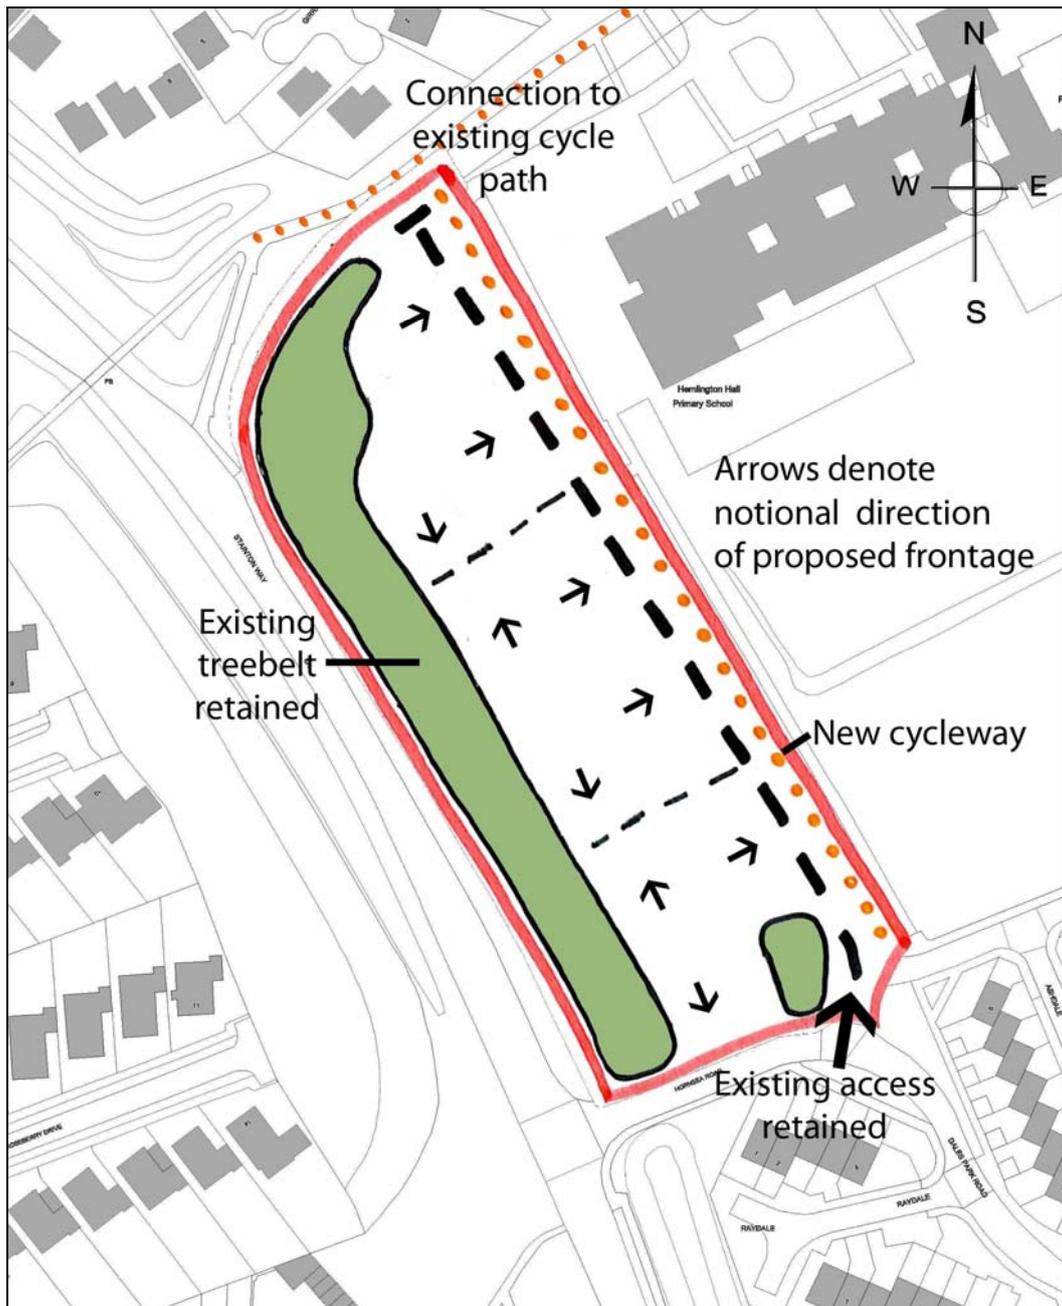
Eastern Site Boundary with Hemlington Hall School
